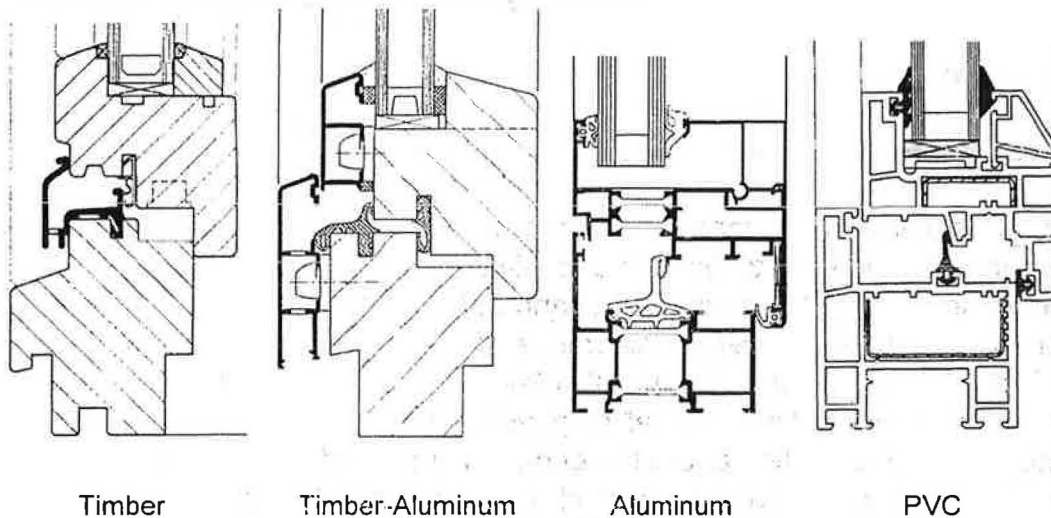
Timber-, Timber-Aluminum-, Aluminum(Al)- and PVC-Windows as example for component alternatives.
